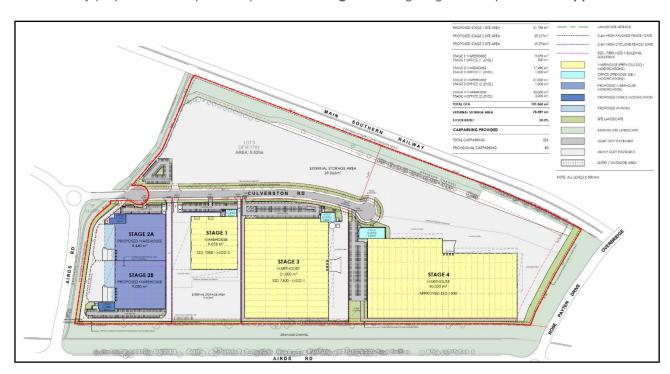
Proposed Architectural Site Plan (drawing CH2CUL – A – 04, revision D, by Watch This Space Design, dated 24/02/2022)
